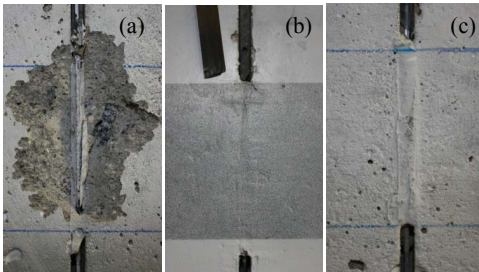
Failure modes: (a) Concrete splitting; (b) CFRP failure; (c) Debonding at adhesive/laminate interface.
